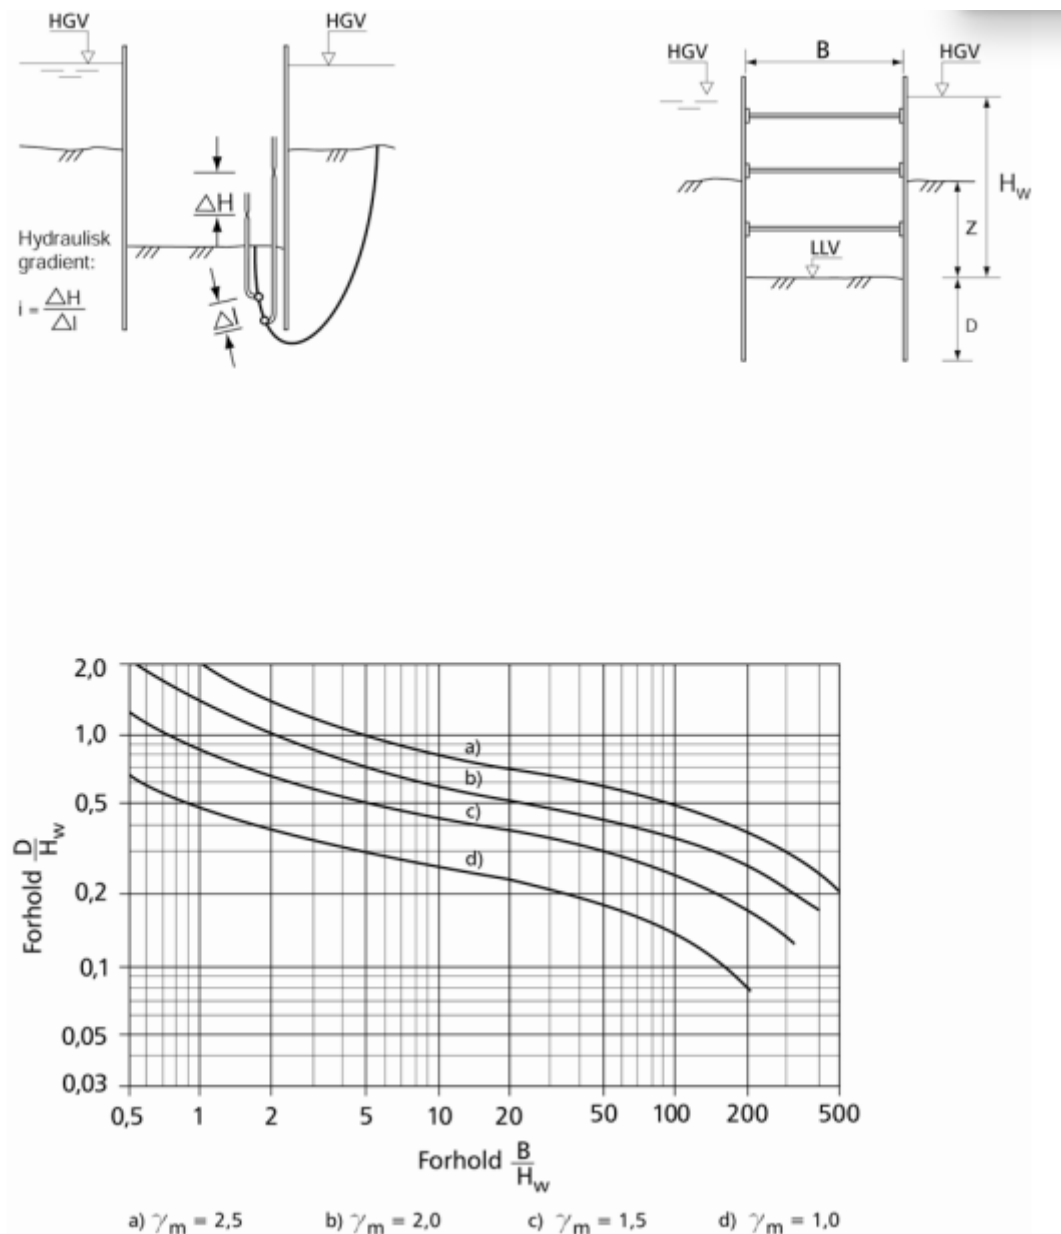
safety against hydraulic foundation failure (taken handbook 016 (p 10-22)). [42]
